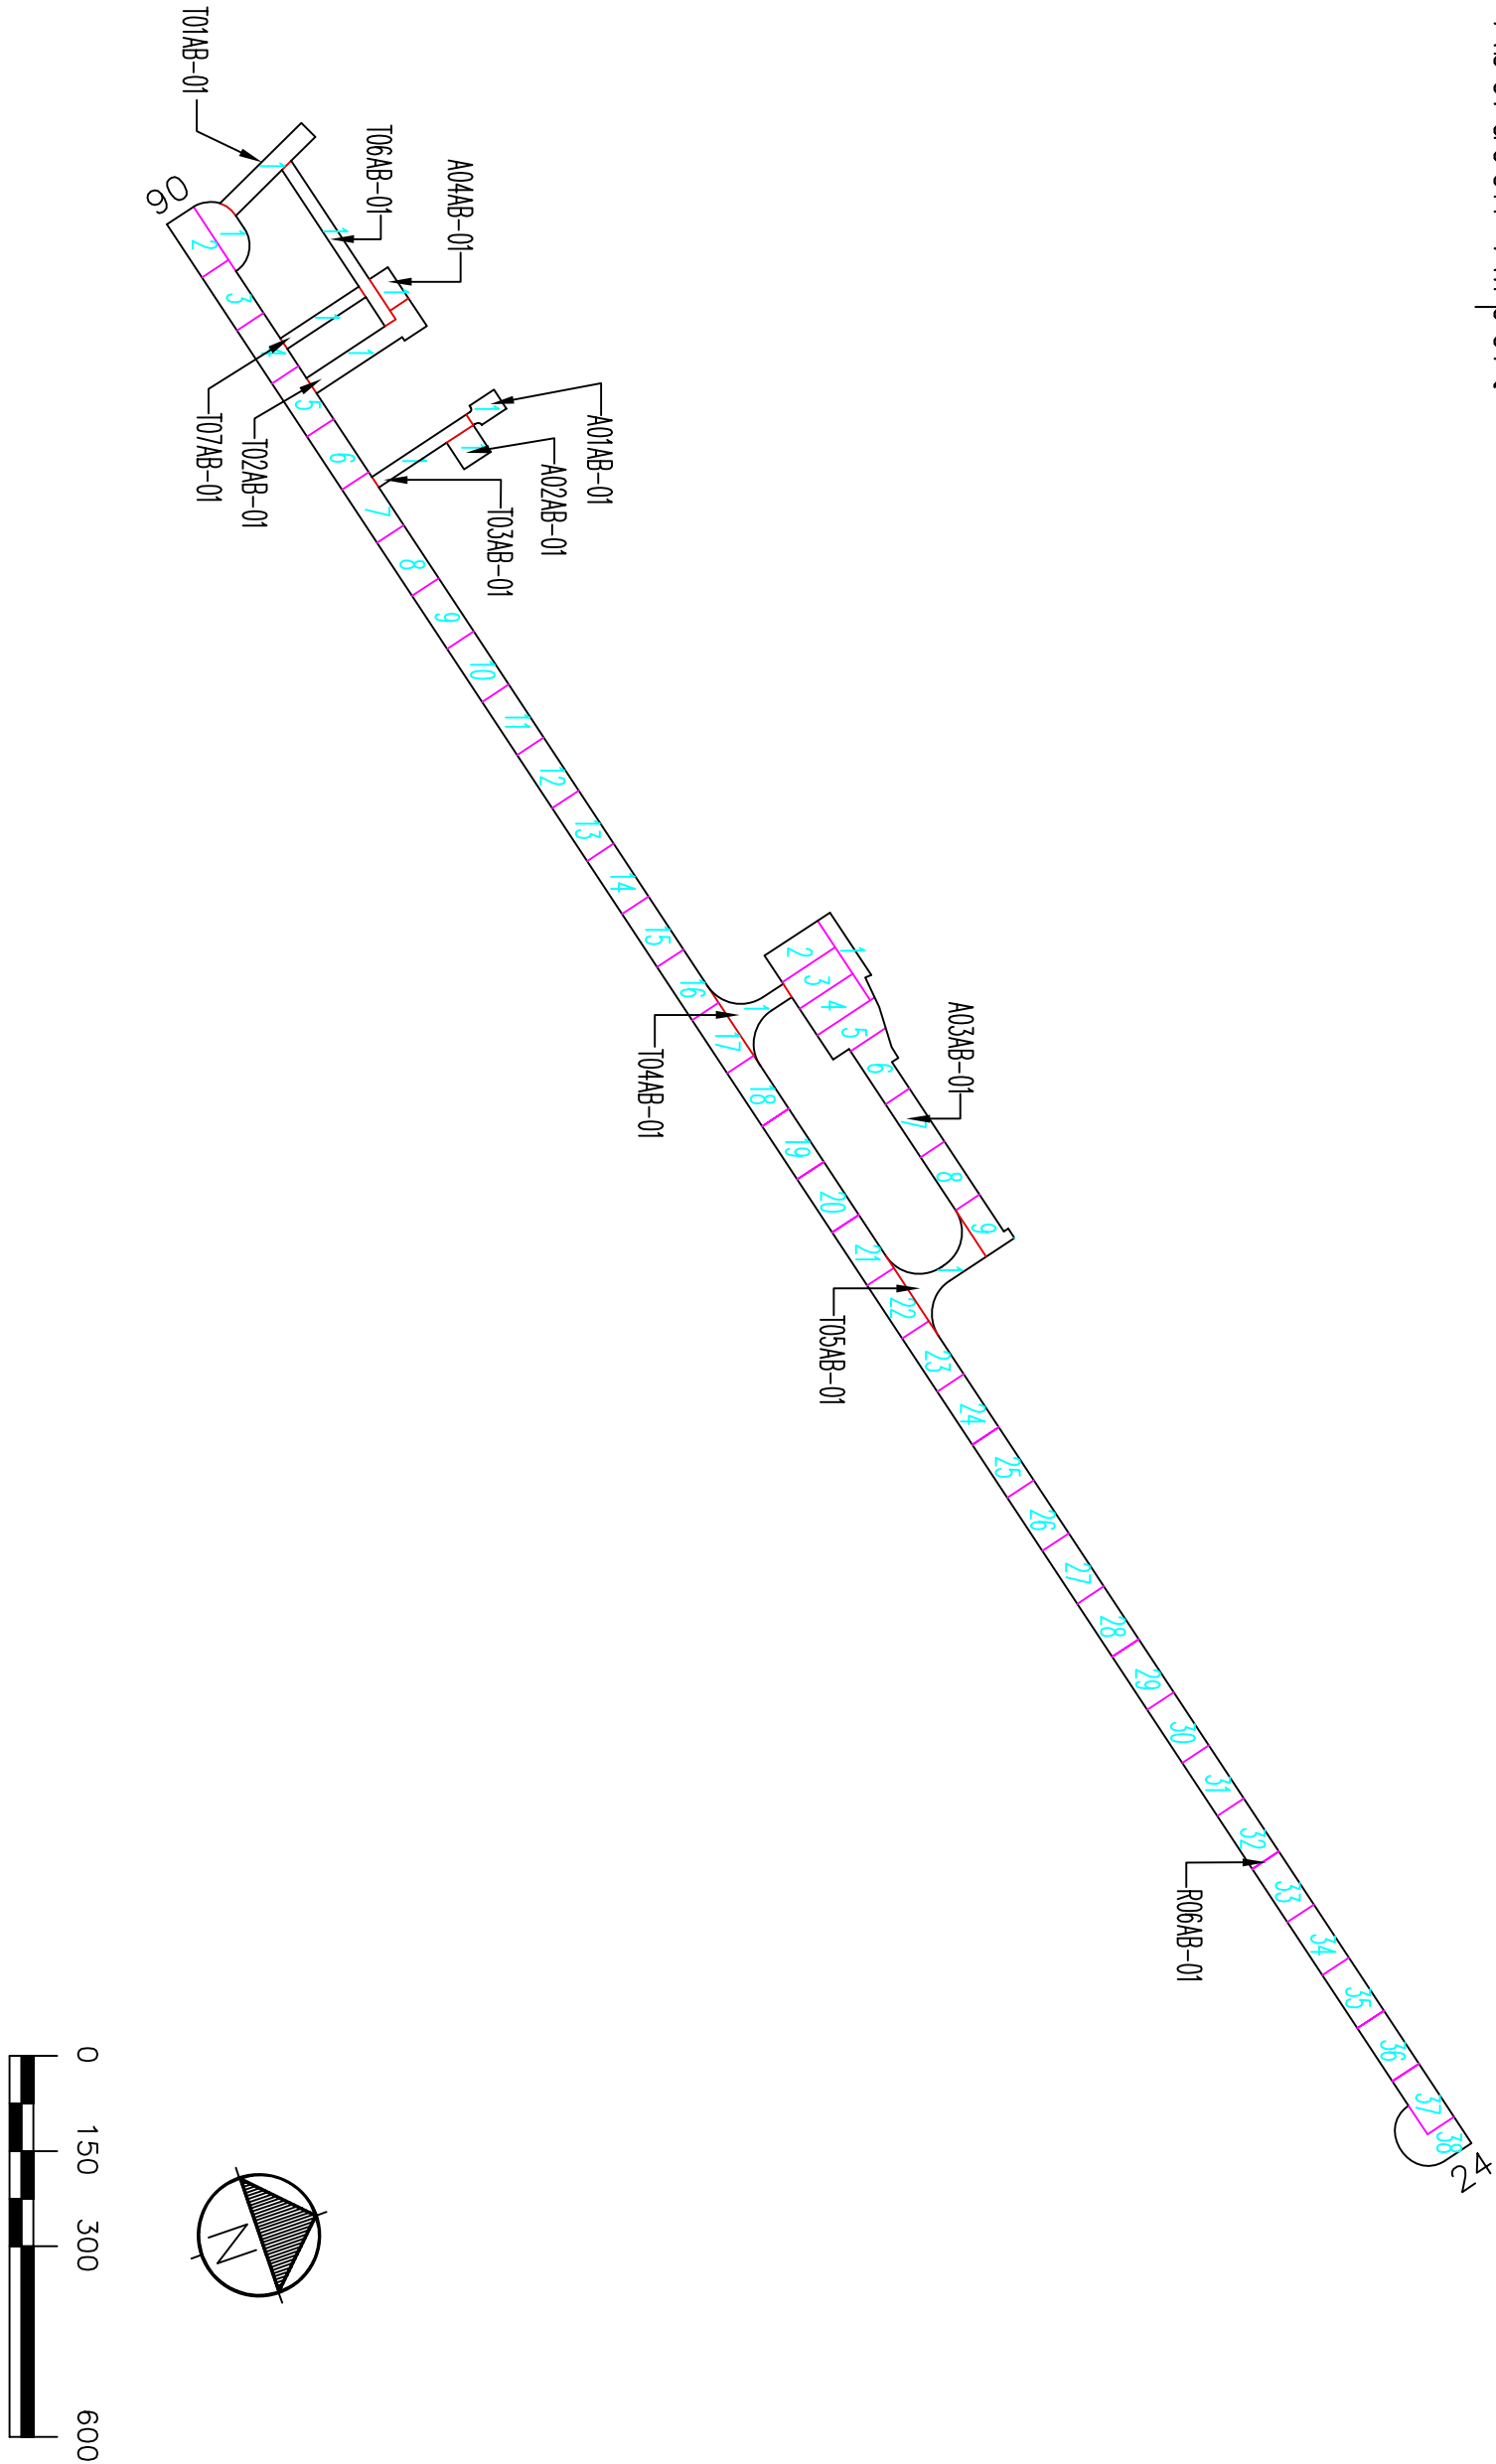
Pavement Branch, Section and Sample Unit Layout.
